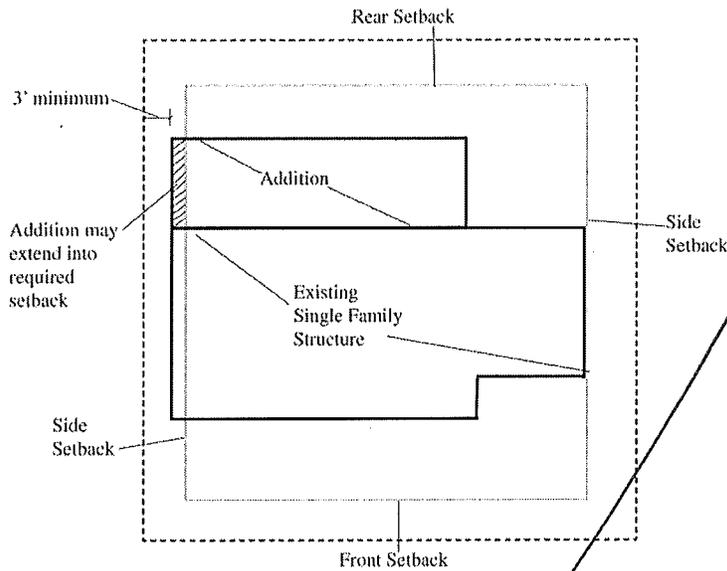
Permitted Additions Into Required Setbacks for Existing Single-Family ((Structures)) Dwelling Units
